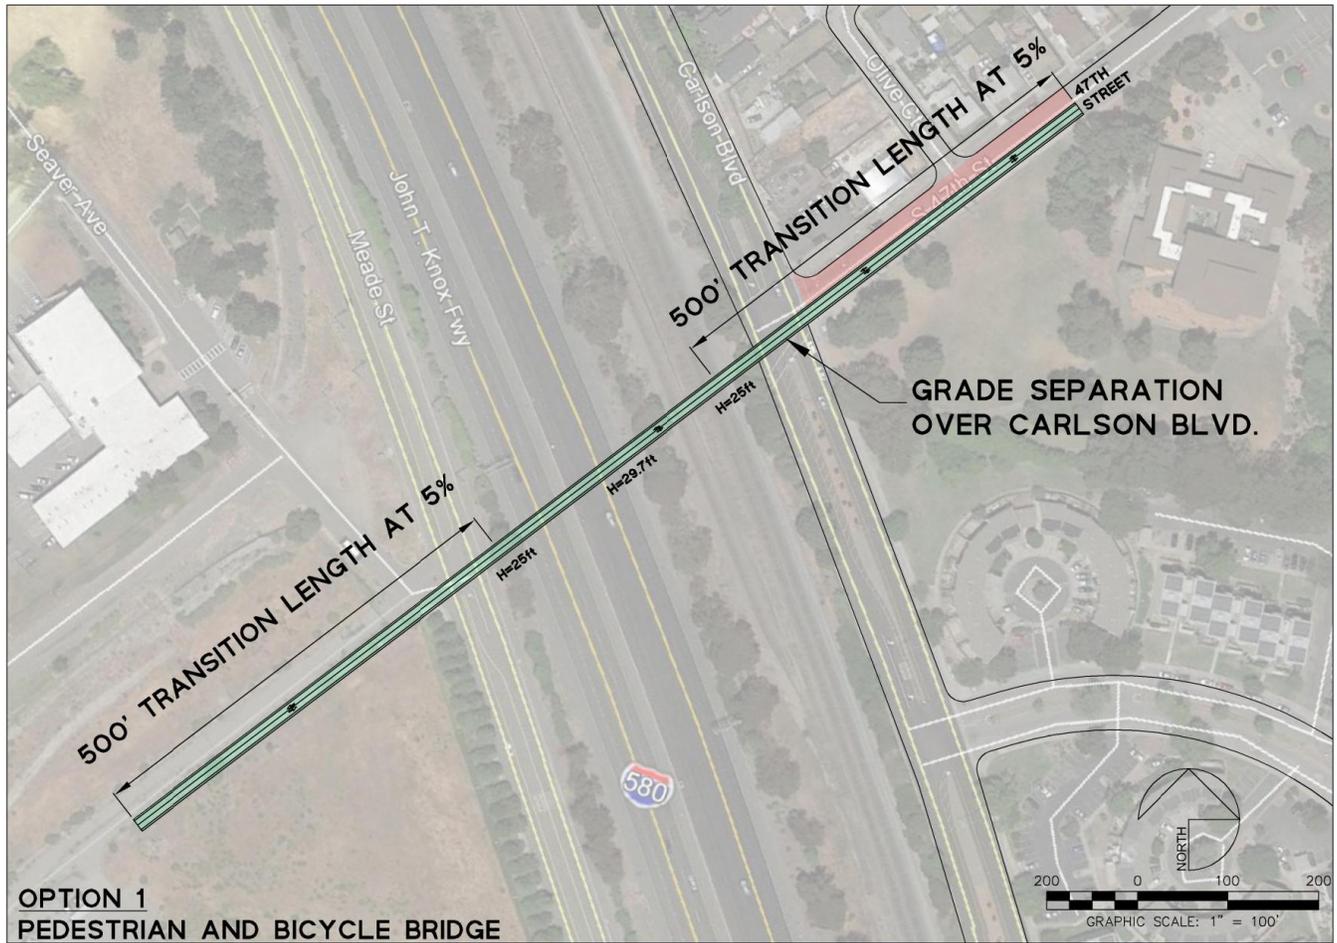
New Connection Concepts: South 47<sup>th</sup> Street Overpass – Multimodal Bridge Option
